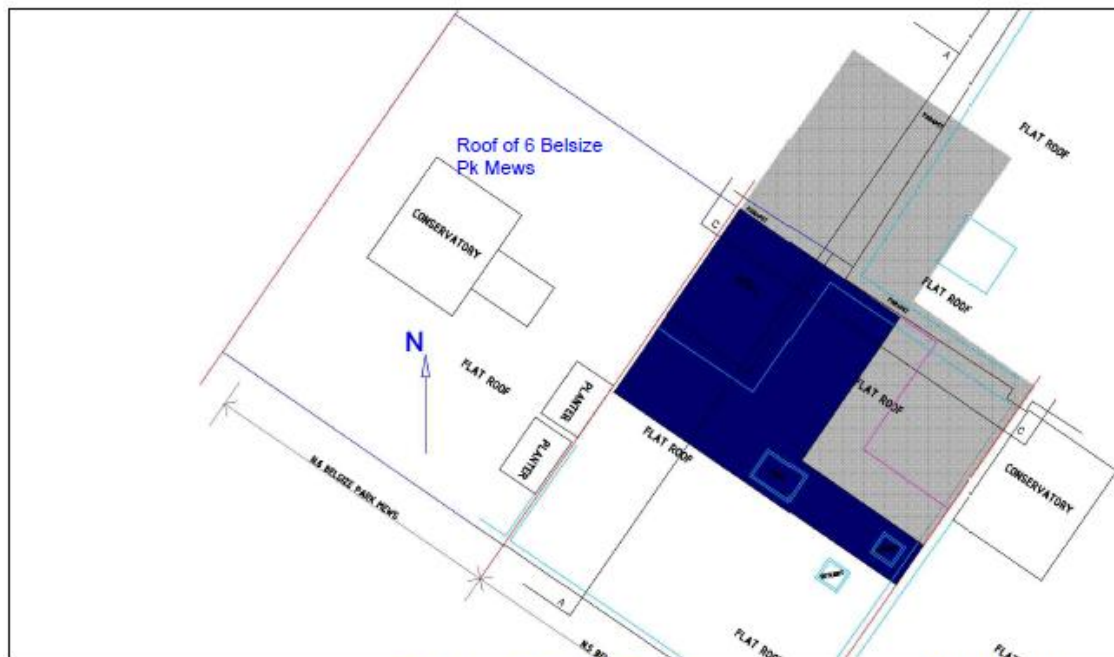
Shadows to Roof of 6 Belsize Park Mews
